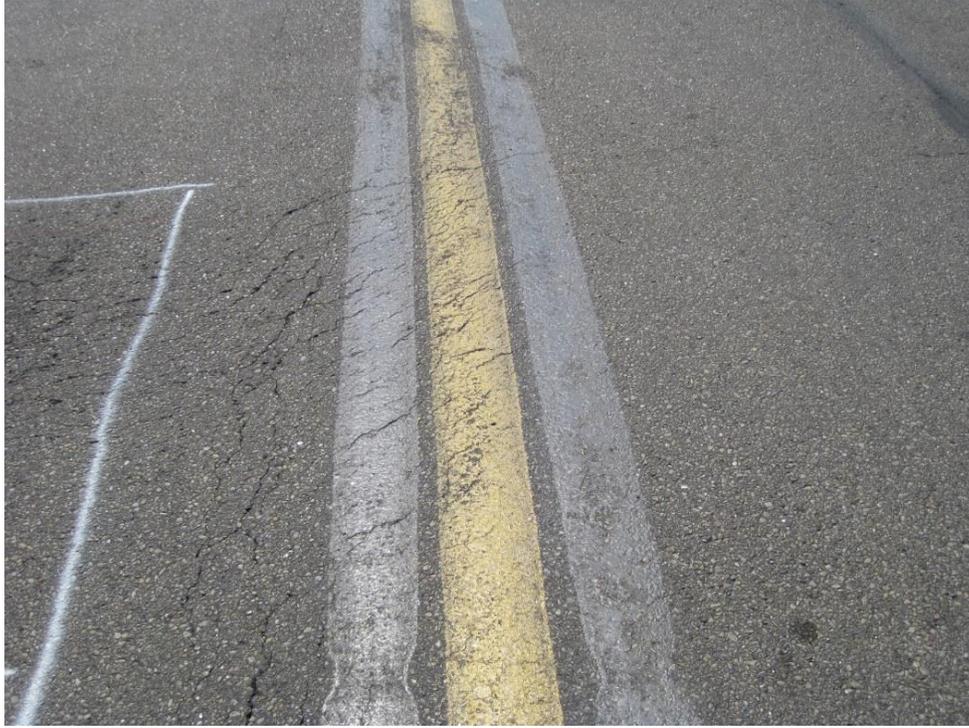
Example of distresses of asphalt pavement at roundabouts.
